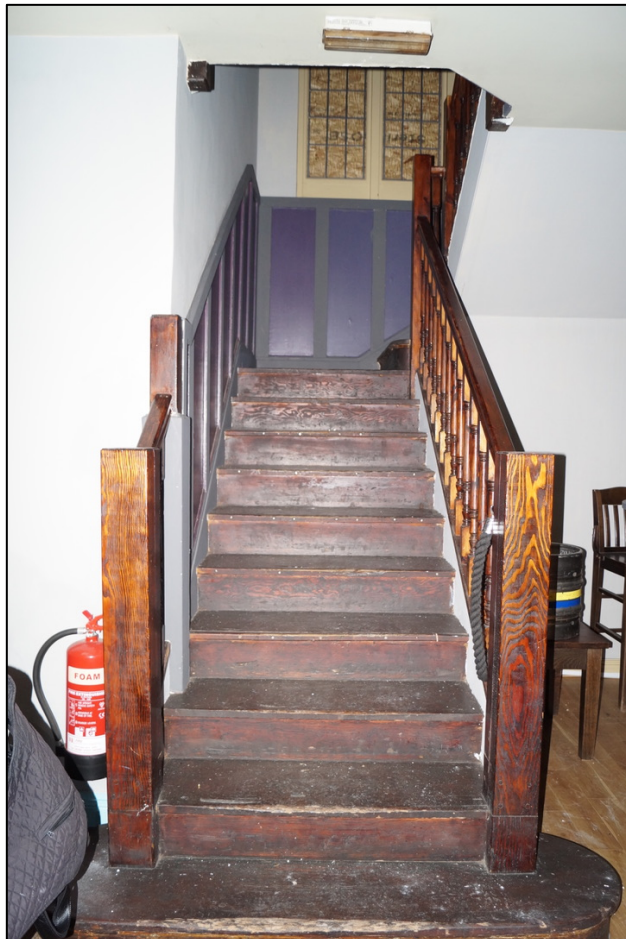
Main staircase between ground and first floor. Balusters are modern but stairs likely to be original.
